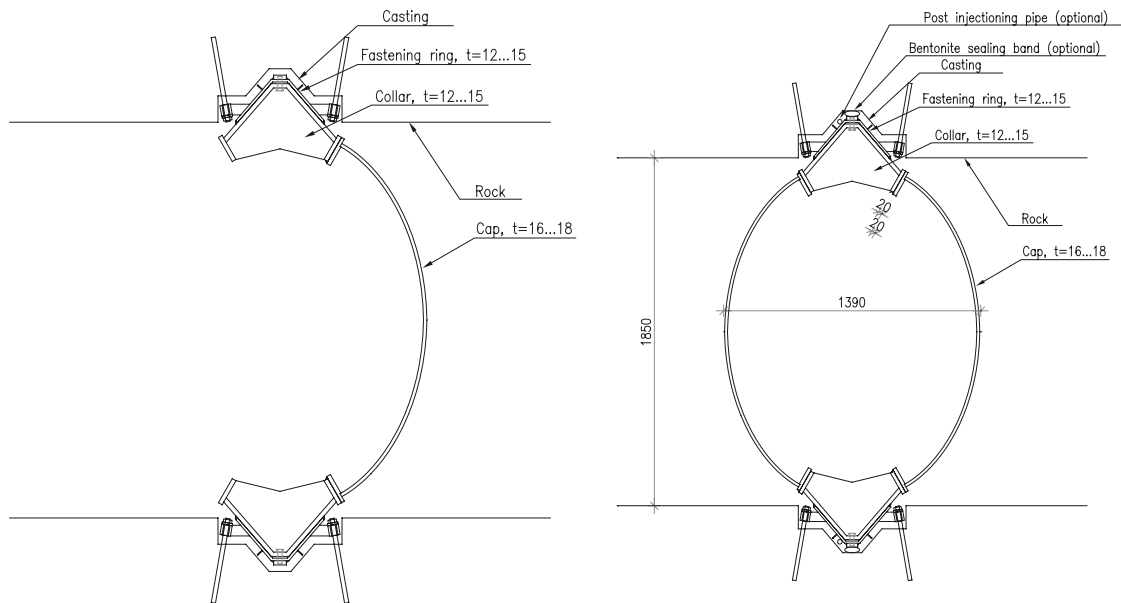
Cross-section of the compartment plug: one-sided with one cap (left) and two sided with two caps (right) dimensioned to withstand pressure from one or both sides respectively.
